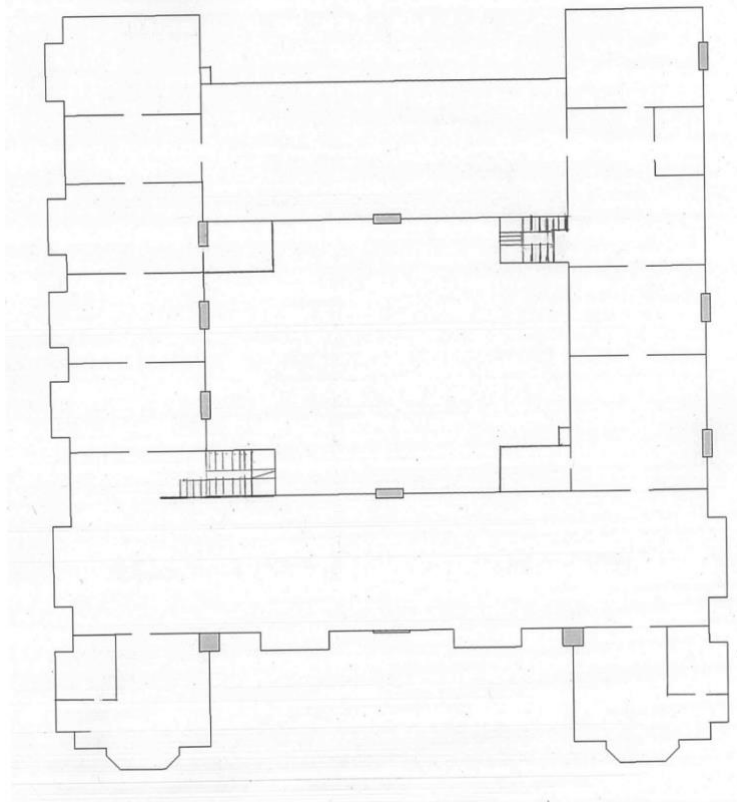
Conjectural plan of the Ground Floor of Weston, © Hilary L Turner
